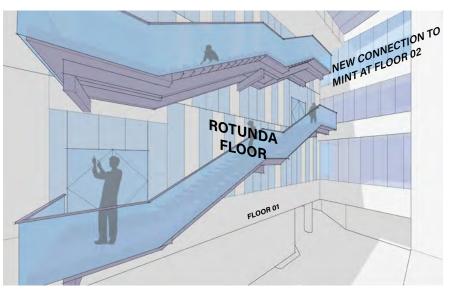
Proposed new staircase to connect first floor and top floors of Bonnell with Mint
